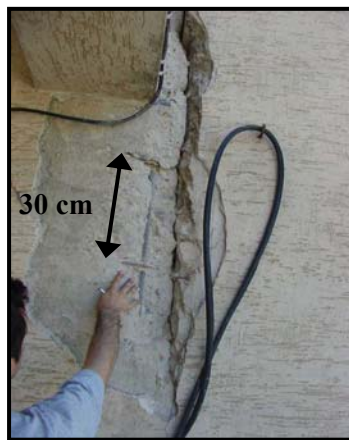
Damage to the ground floor column-C12 and sparsely spaced ties
